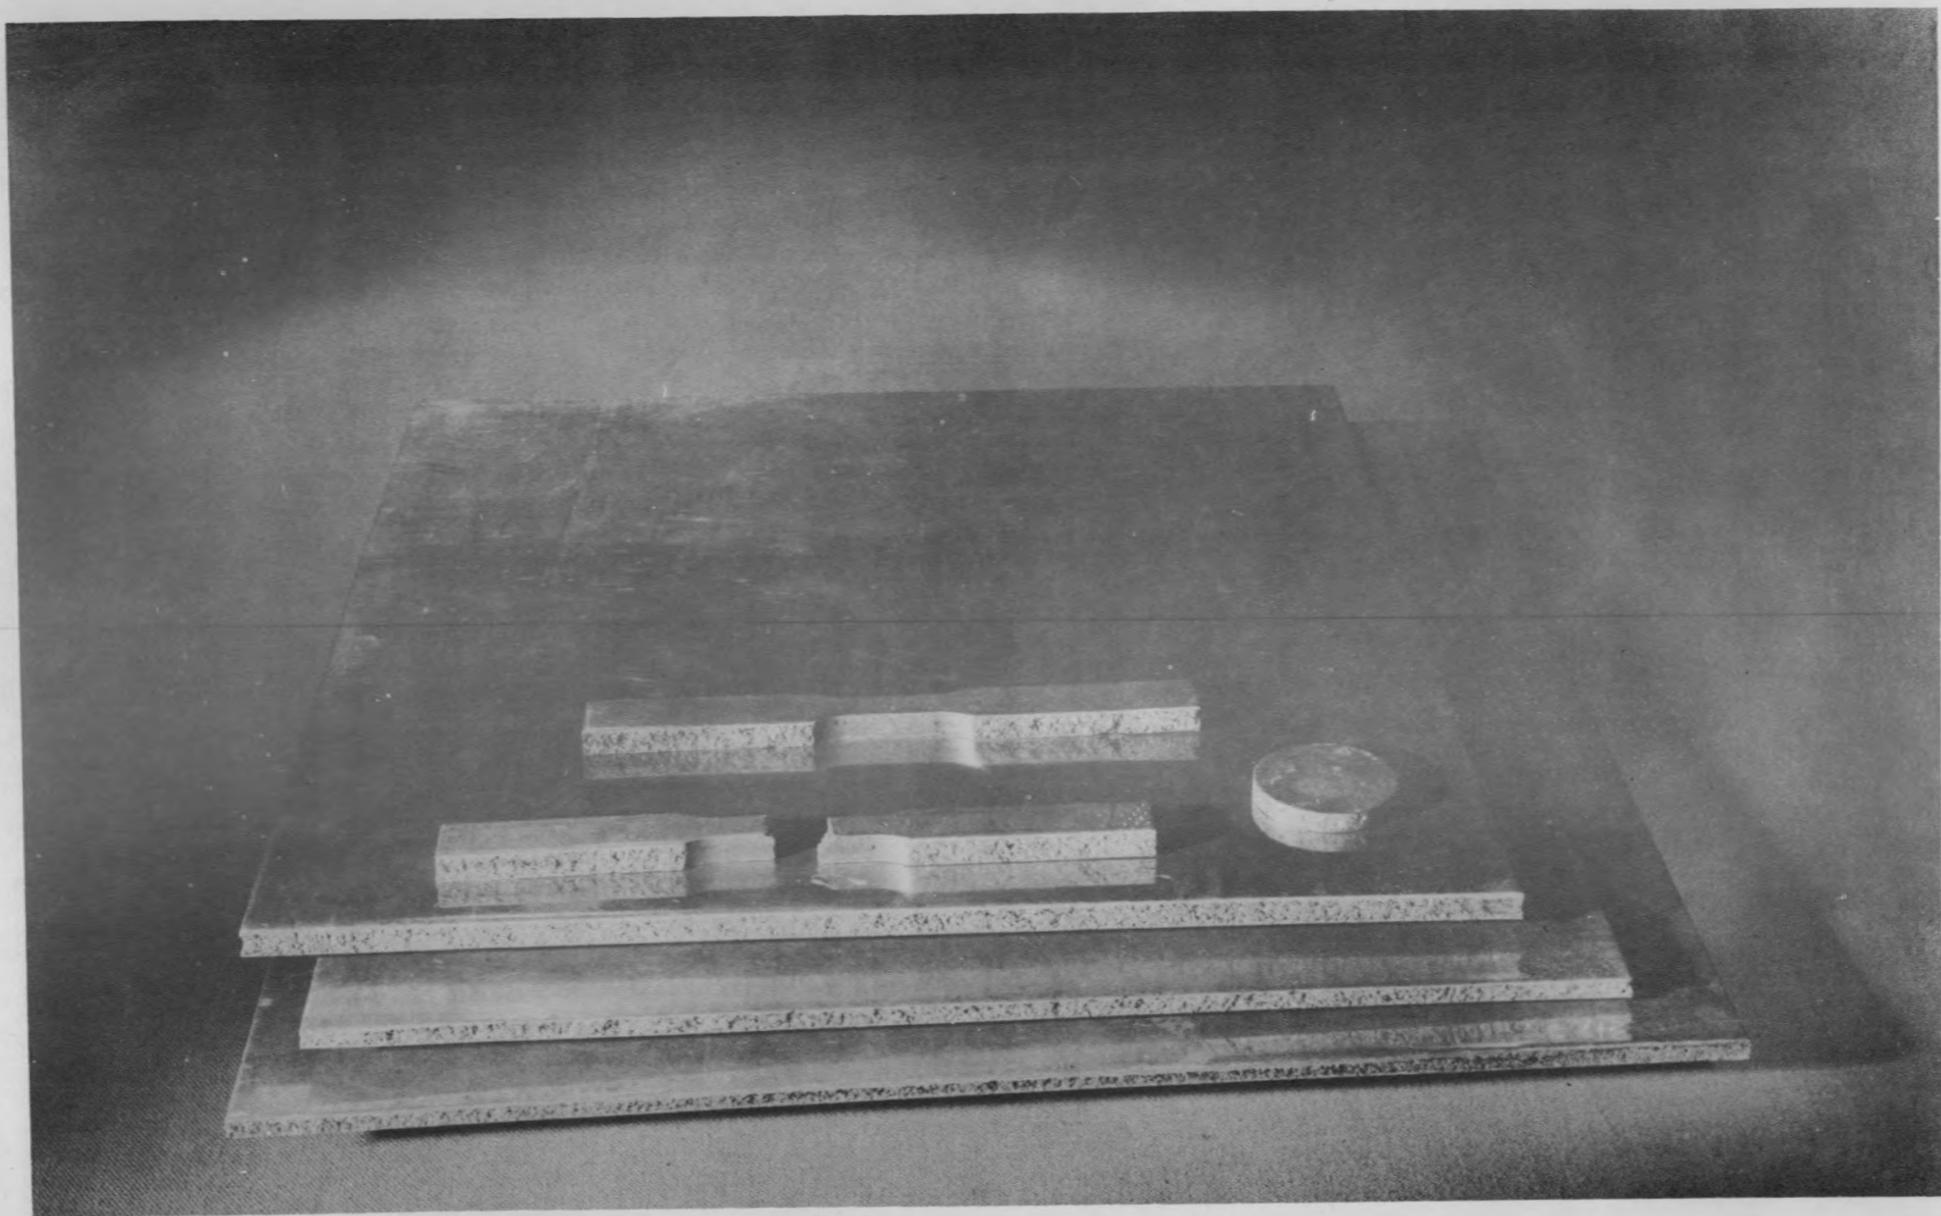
FINISHED BORAL SHEETS AND PIECES
